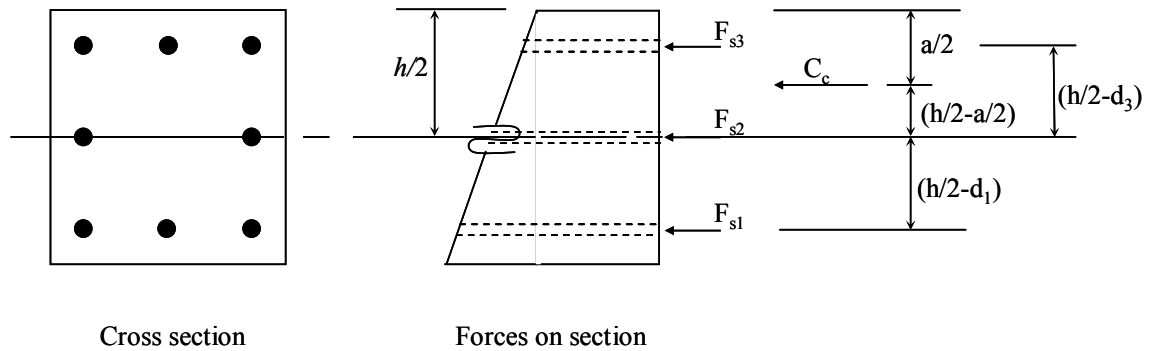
Internal Forces and Moment Arms About the Column Centroid.
